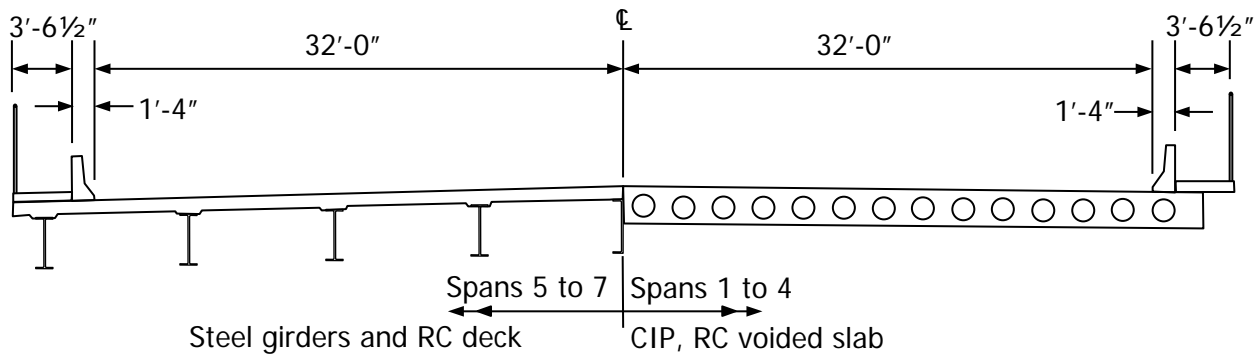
Typical cross-sections and dimensions for Bridge Number 15558X.
